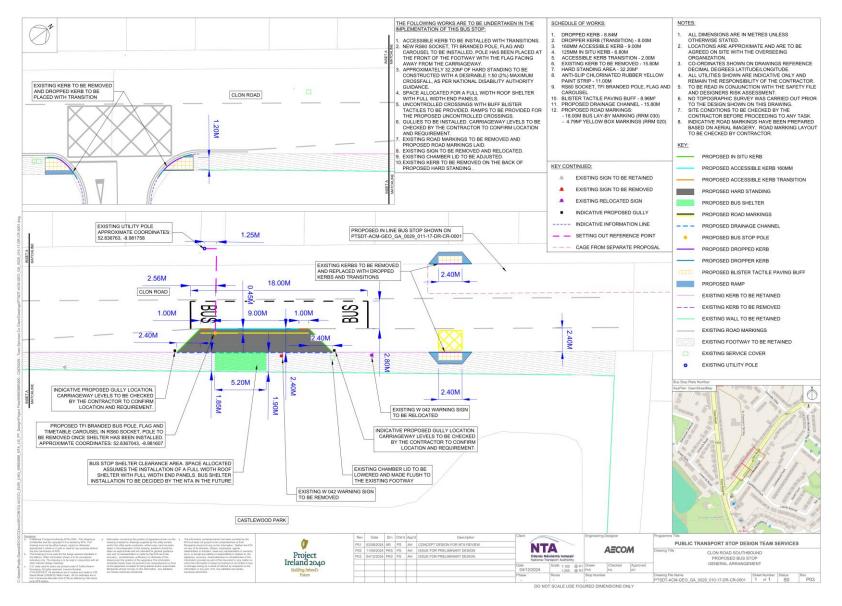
EXAMPLE OF A TYPICAL BUS STOP LAYOUT (AECOM, 2025).
